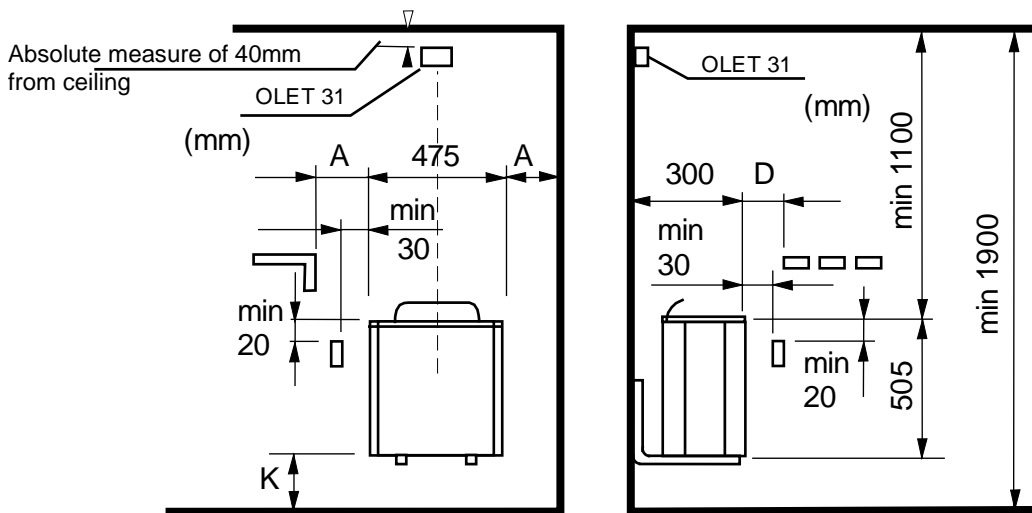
Heater safety distances and sensor position to wall 40 mm from ceiling
